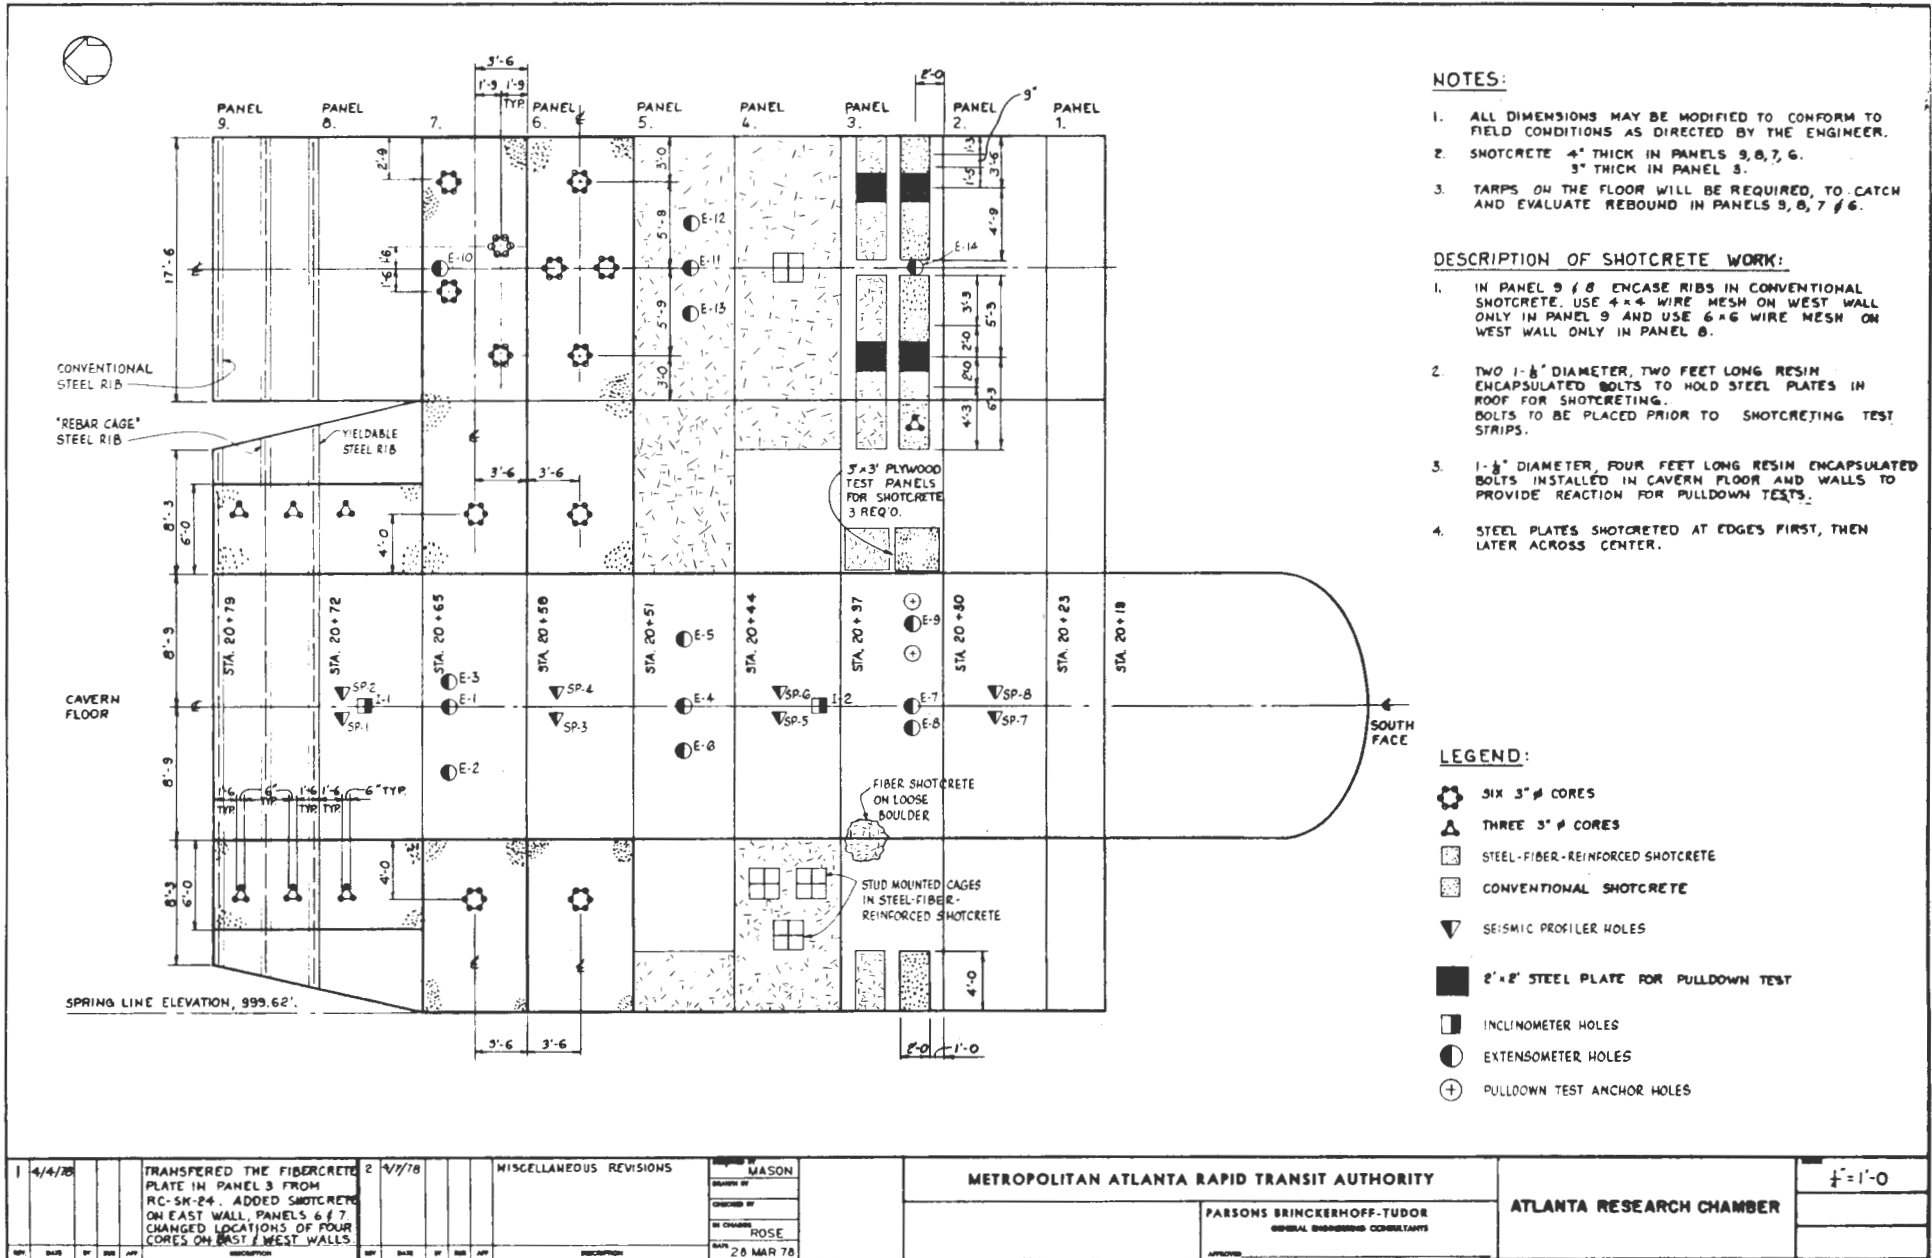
EXPLODED VIEW OF THE TEST CAVERN ROOF, FLOOR AND WALLS
